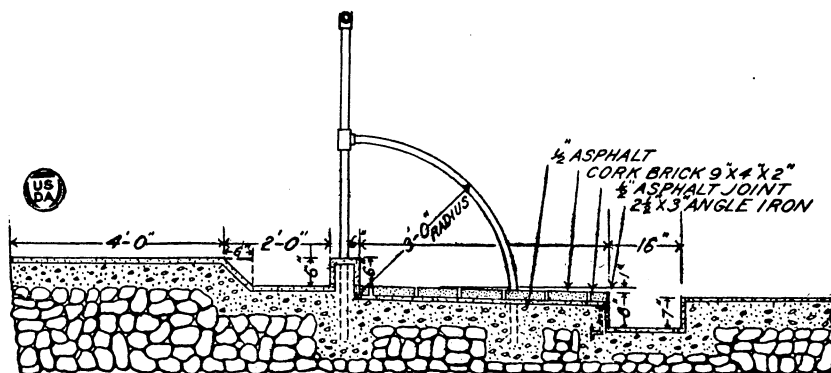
Longitudinal section of cow stall with cork-brick floor.
